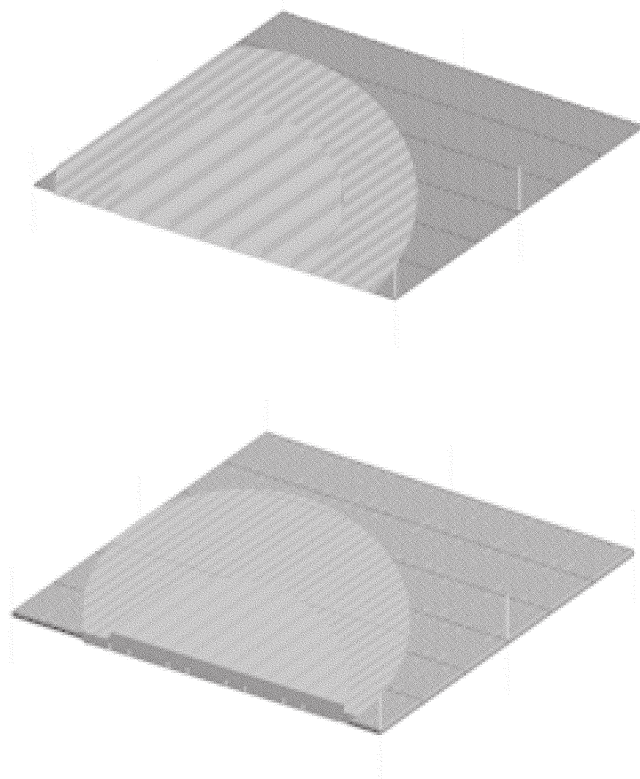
FE model of floor structure—shell elements for steel deck (T) and solid elements for concrete (B).
